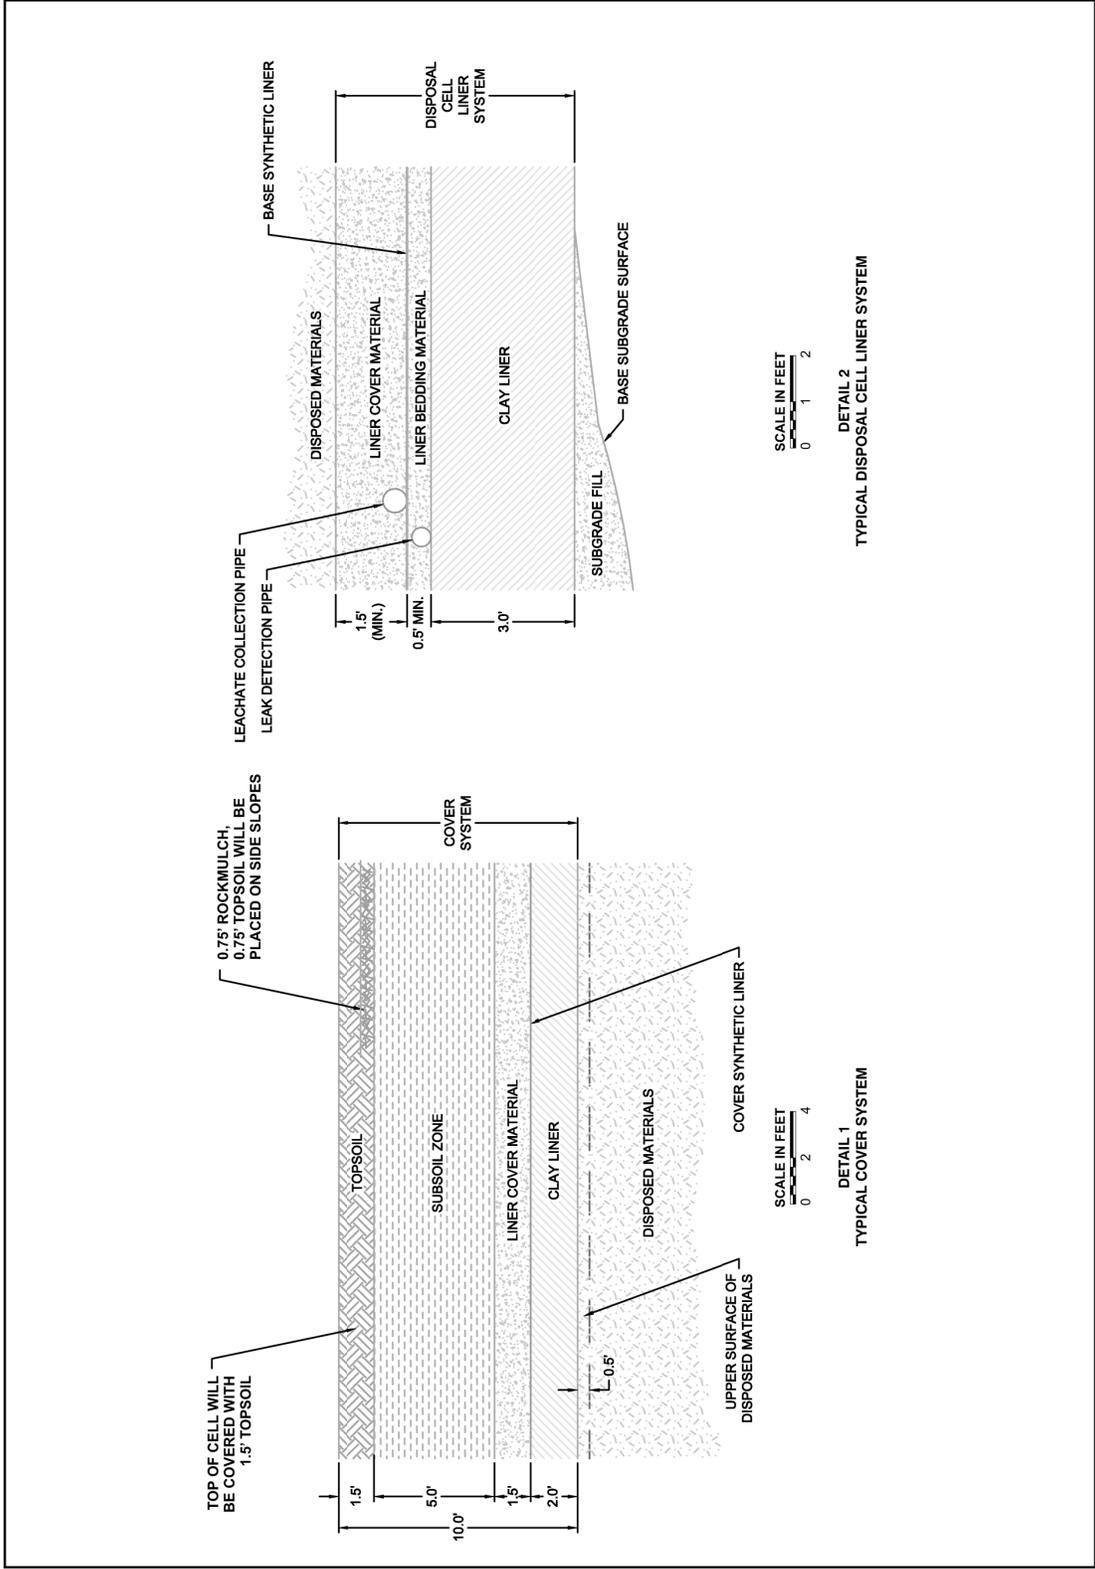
SFC Disposal Cell Cover and Liner Details
